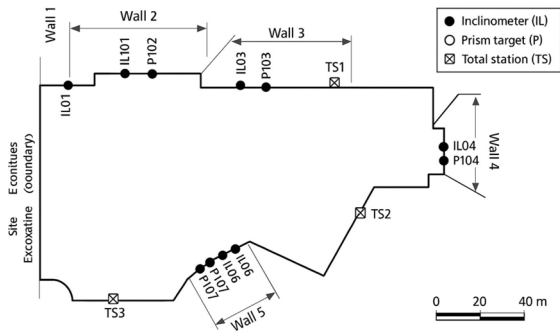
Site plan showing locations of inclinometers, automated total stations and 3D prism targets (Foo et al., 2023)
